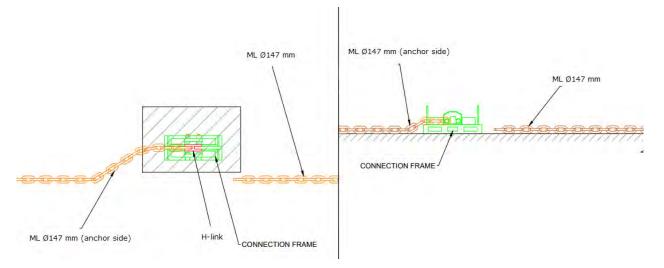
Installation of SCF and connection of ML#2 (anchor side from cut point)
